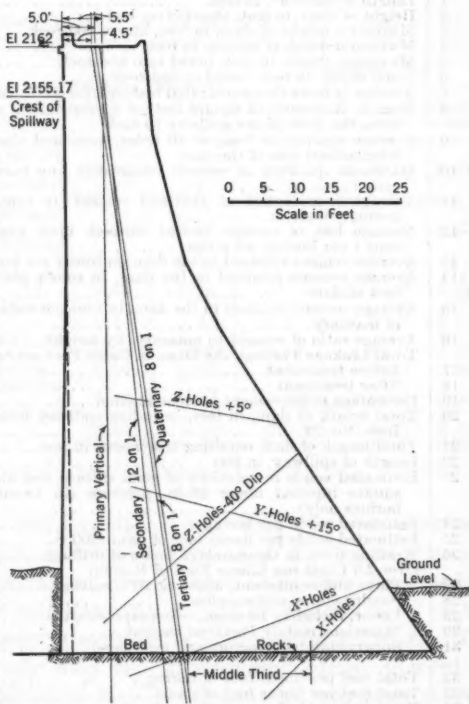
TYPICAL SECTION OF SHIRAWTA DAM SHOWING POSITION OF THE SEVERAL SERIES OF BORINGS.
